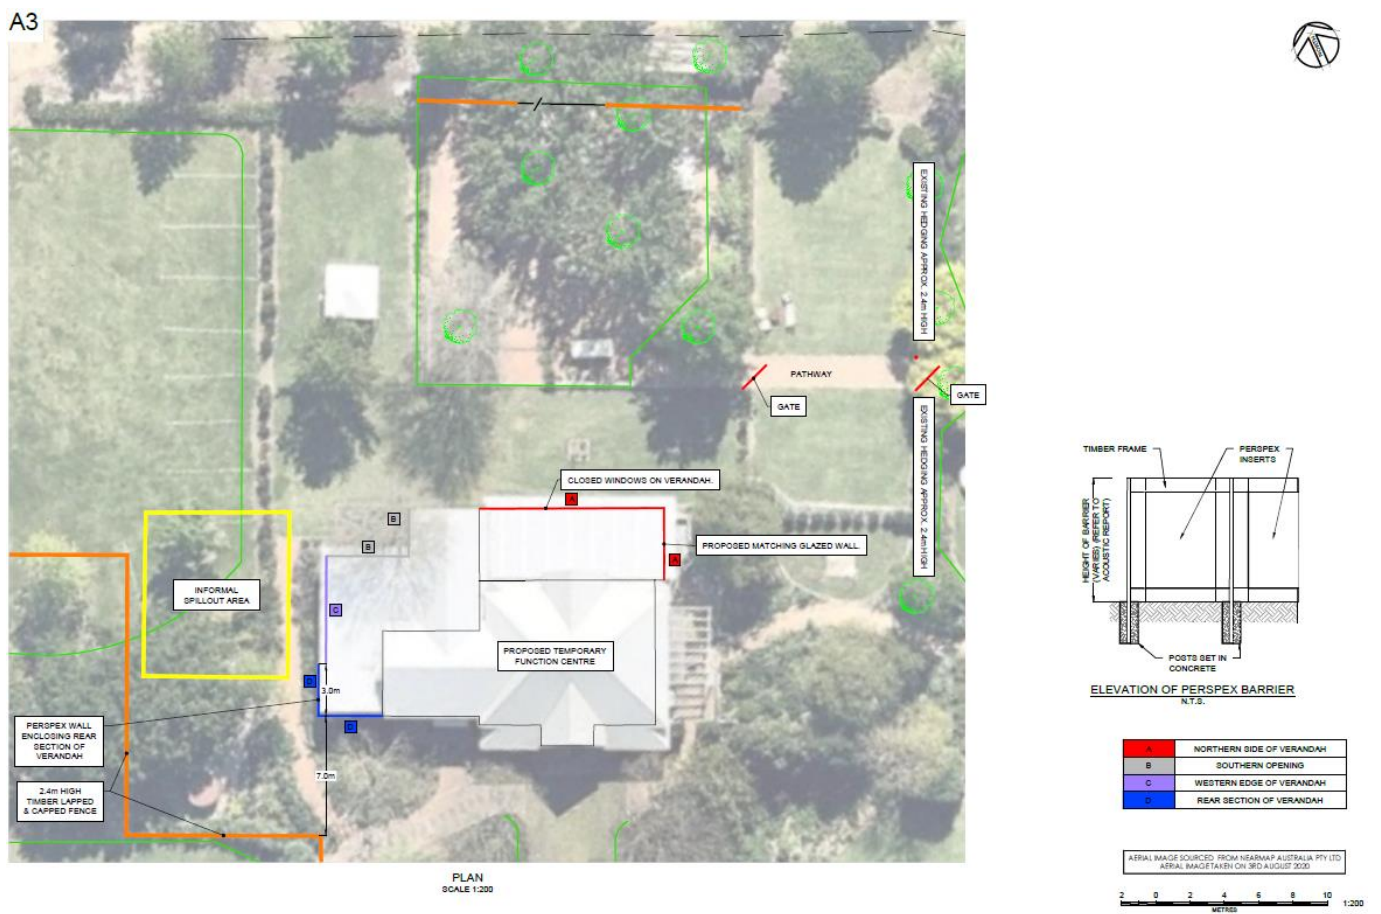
Acoustic Measures Plan (Sheet 141) of proposed use (Source: BRS 2023)
